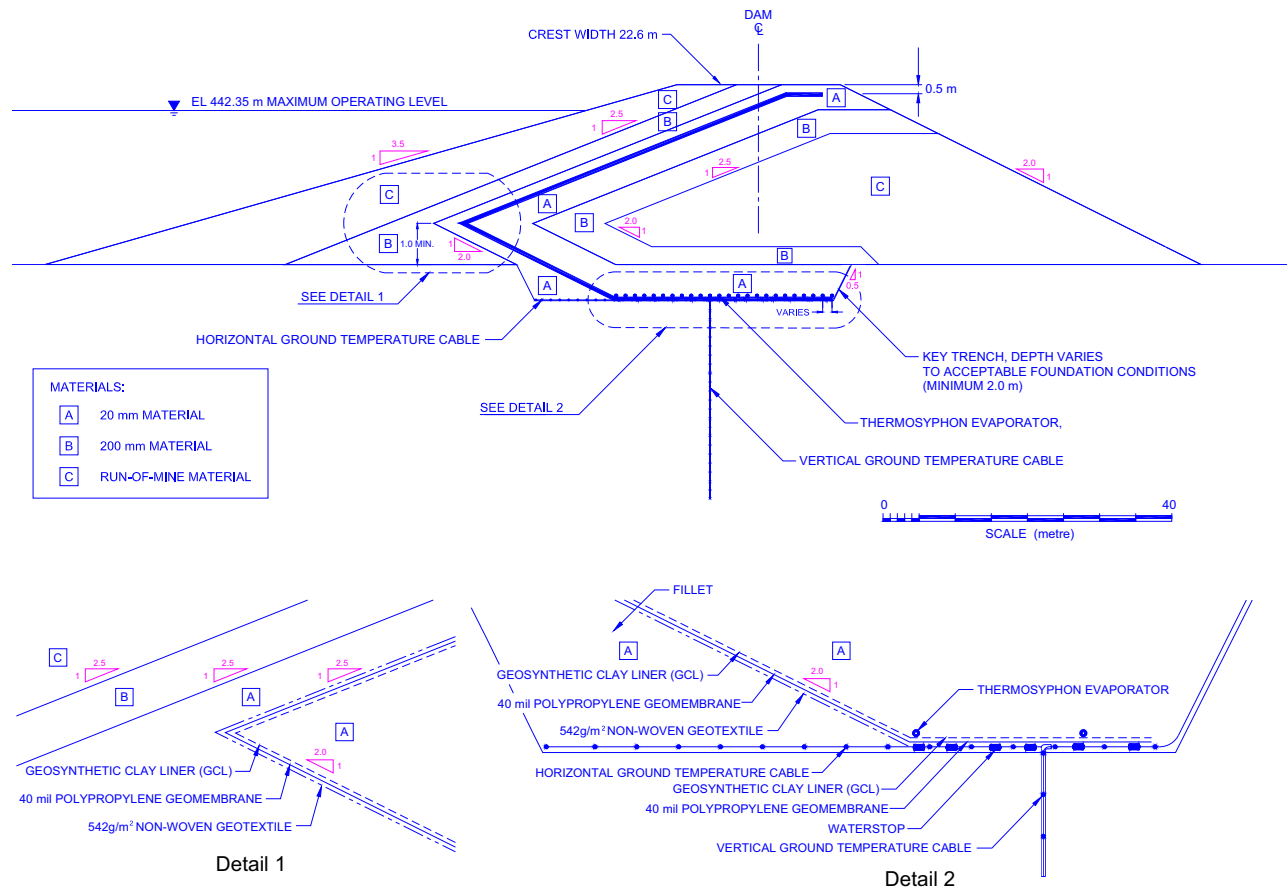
Generalized Dam Cross-Section, Waste Rock Dam
